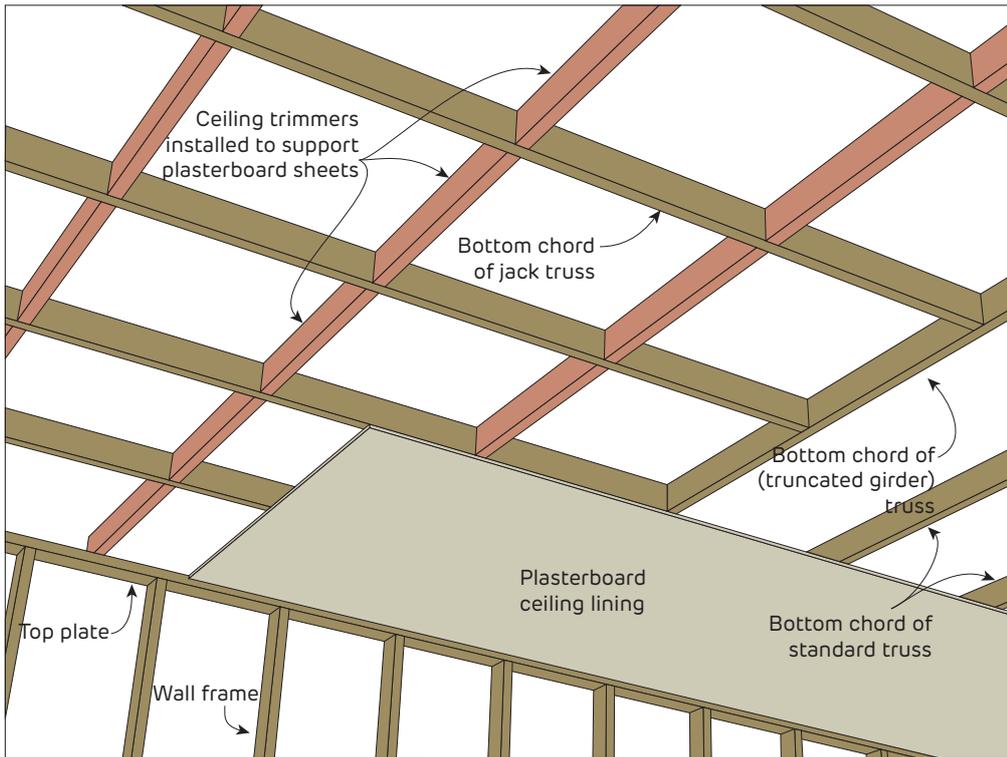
Trimmers to Support Ceiling Lining at Change of Truss Direction
